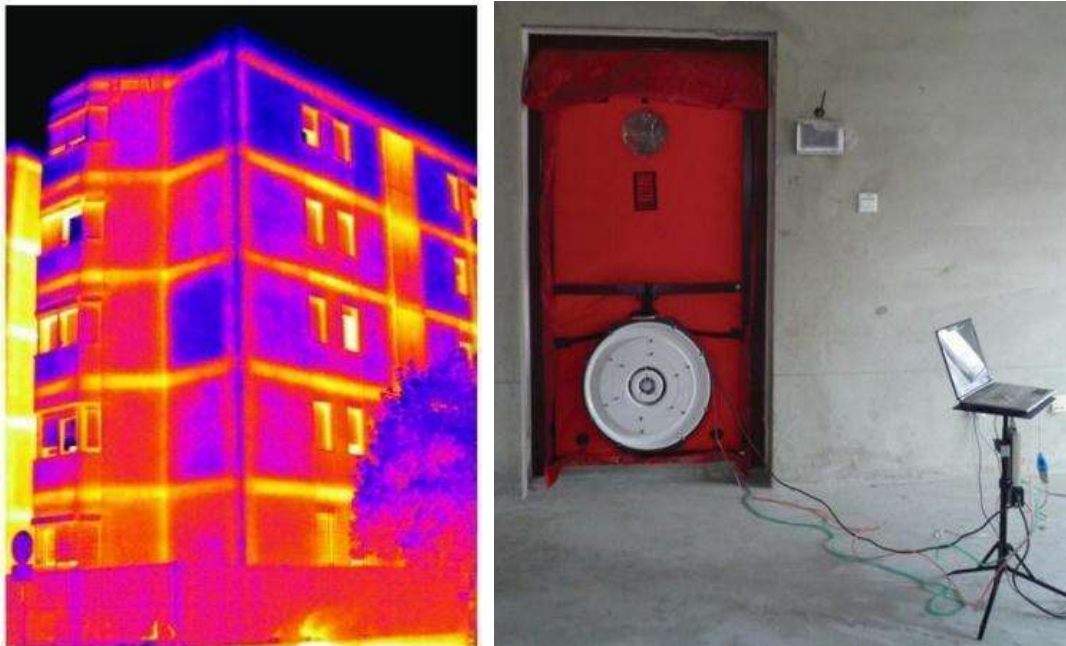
and 3b. The on-site building envelope assessment: (on left) infrared thermography and (on right) the blower door test (Source: Bienvenido Huertas, 2020 and Yongming and Duanmu, 2016)
